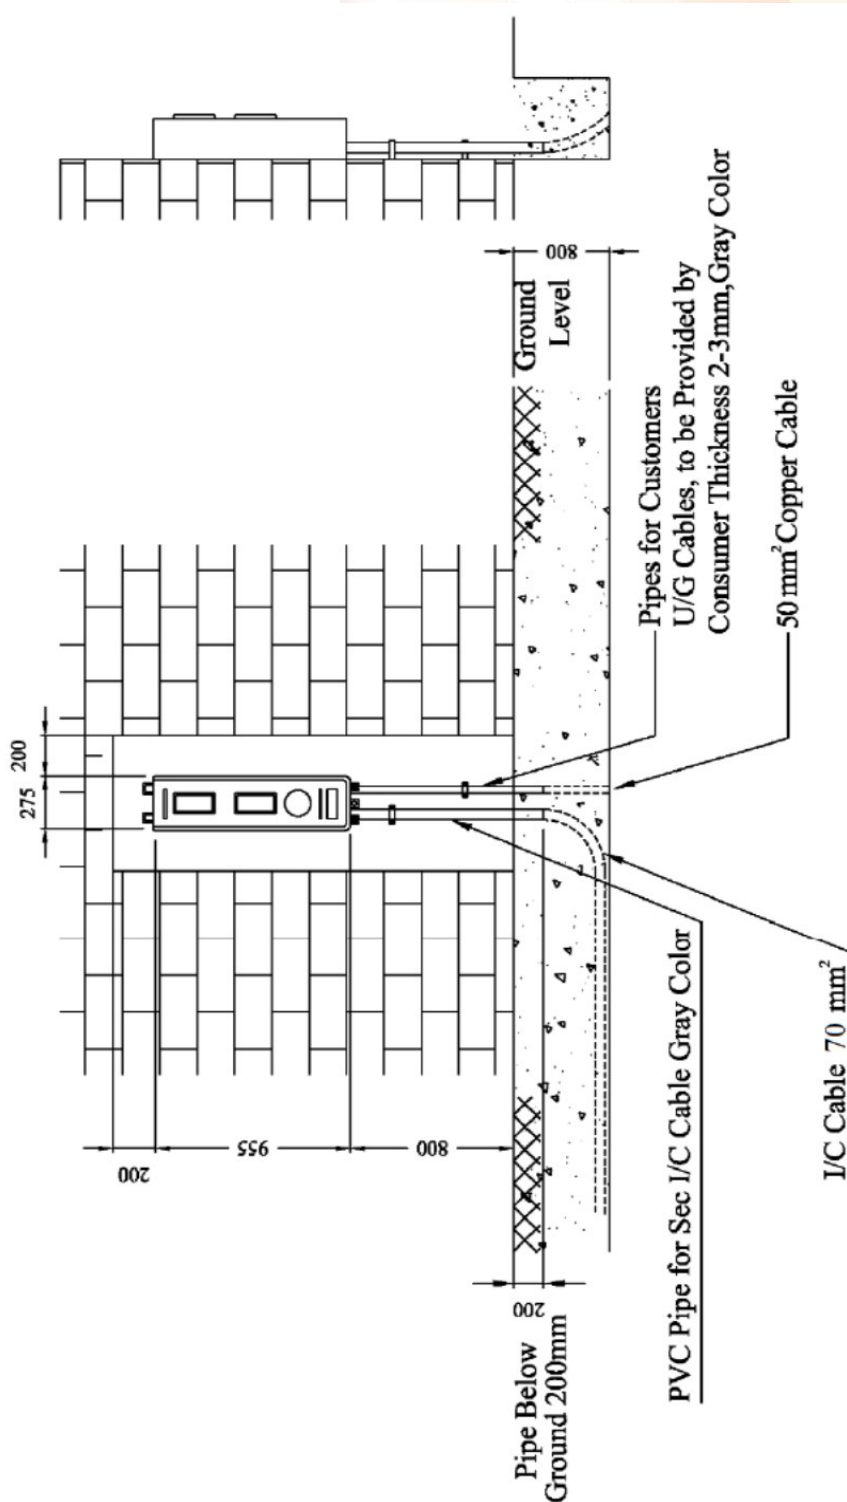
Installation of 1 Direct KWH Meter on the Front Wall
